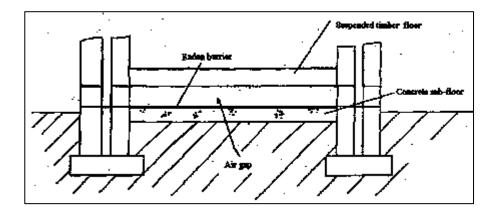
Ventilation space under the floor for radon gas discharge [57]
